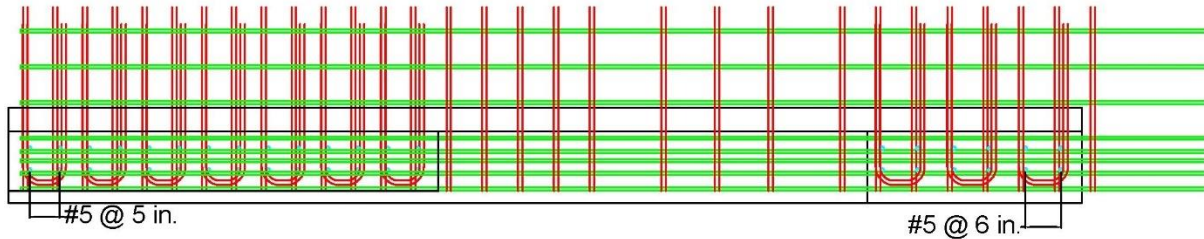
Option 2, Interior Post Deck Reinforcement, Plan and Elevation Views
